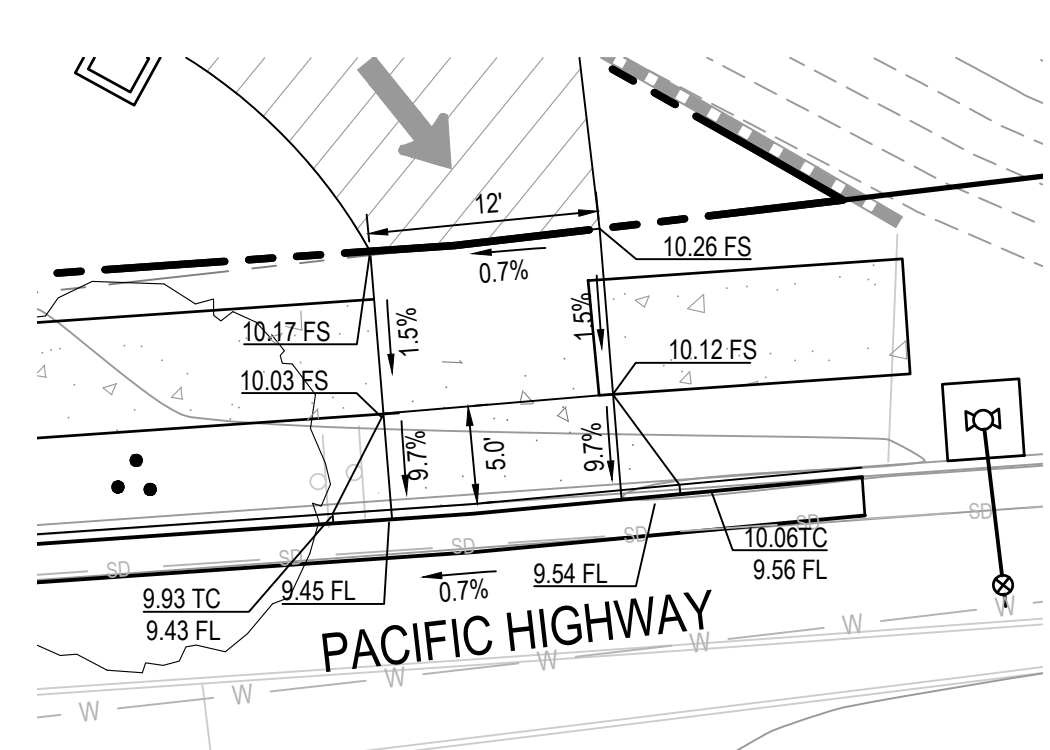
DETAIL - CURB RAMP GRADES AT INTERSECTION SCALE: 1" = 10'
